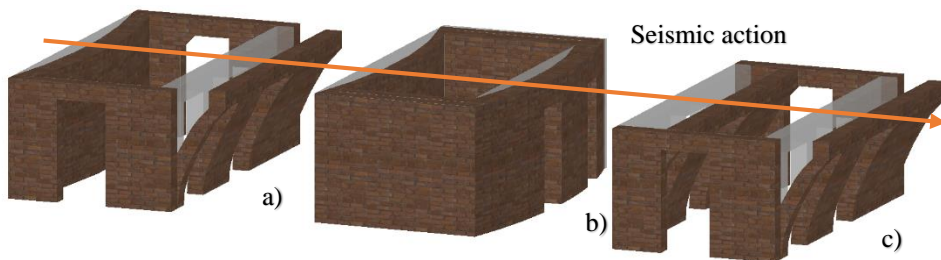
Typical behaviour of masonry buildings: a) building with walls not tied together; b) building with deformable floors and tied walls and c) building with rigid floors and walls not tied together.
